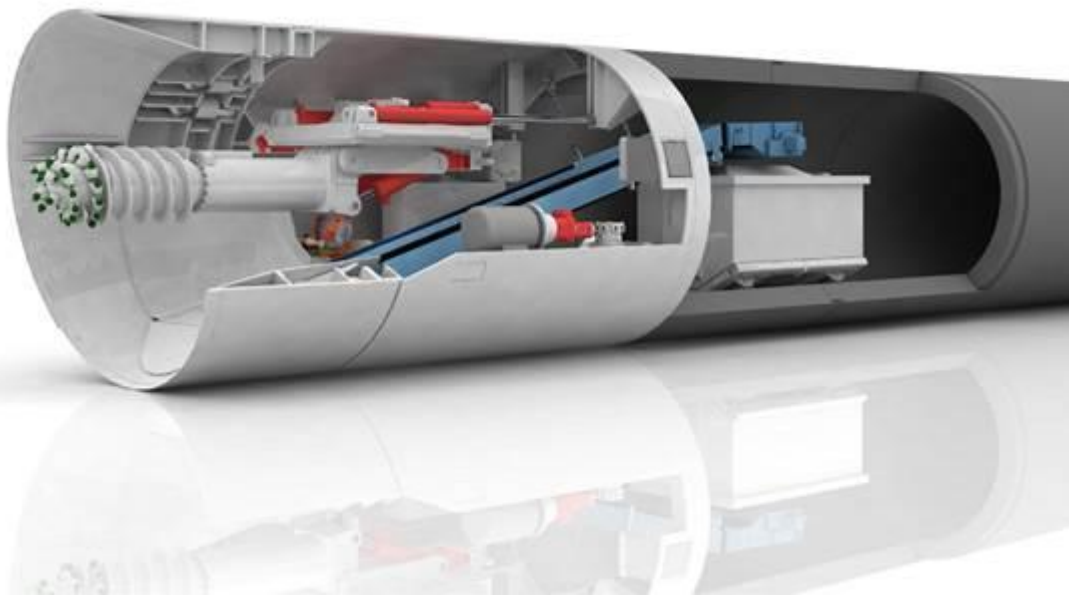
Schematic of Open-Shield Pipejacking with a Road Header (Conveyor for Spoils Loading of Muck Cart)
